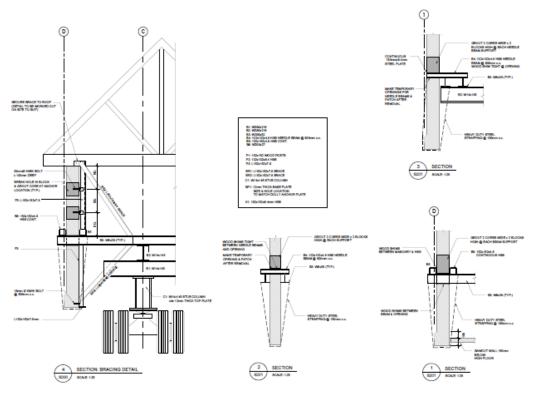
A revised set of structural drawings : sections and details illustrating the method of securing the building. Source Cleland Jardine Engineering Ltd. 2023
